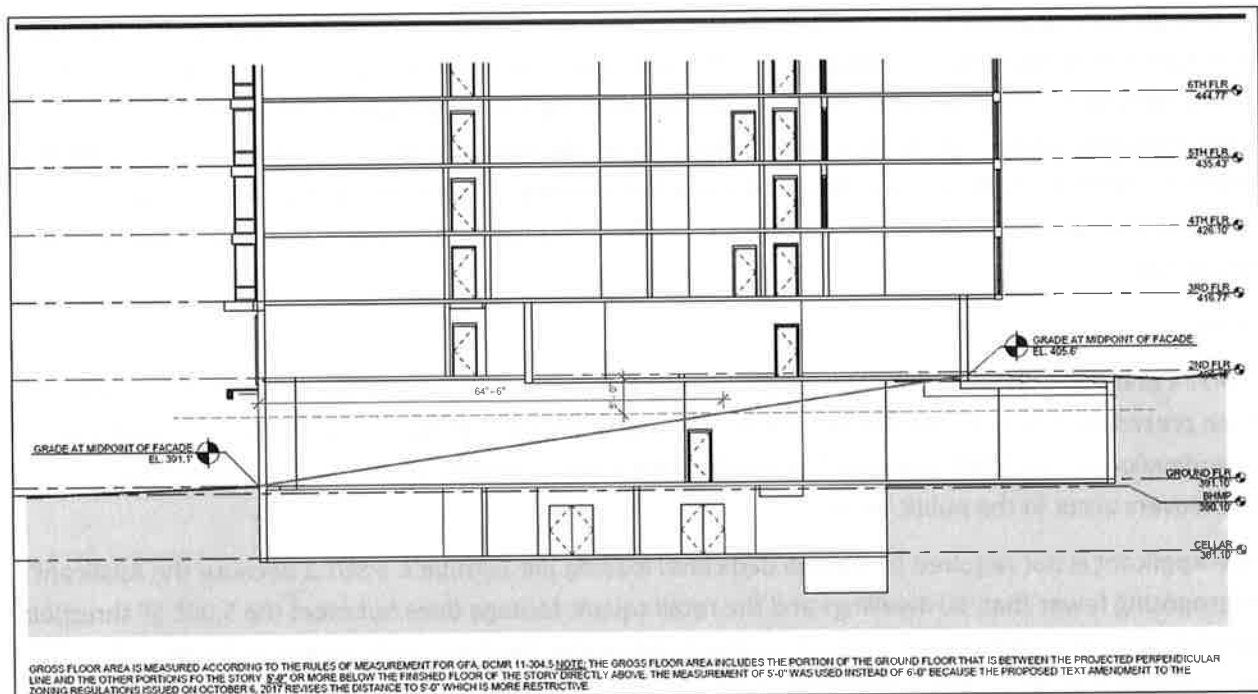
Gross Floor Area Section (Source: Applicant – Dated March 19, 2018)
